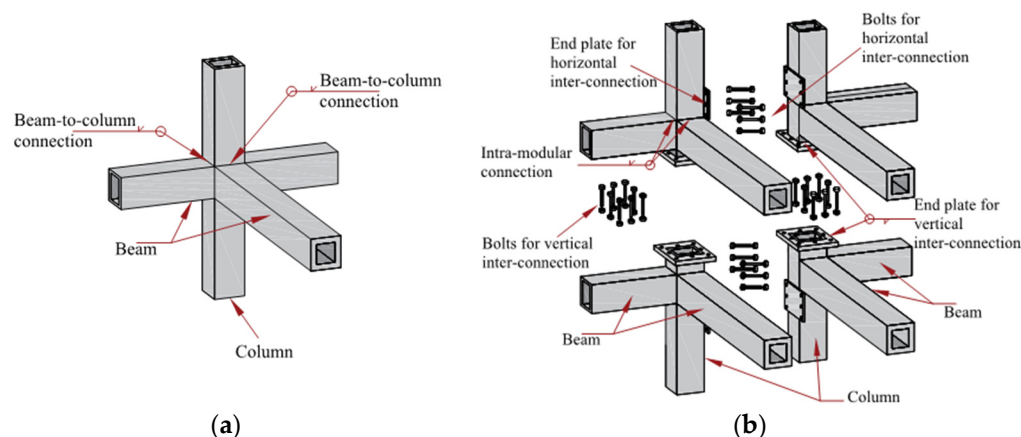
Details of a joint in (a) conventional (b) corner-supported modular structures.
